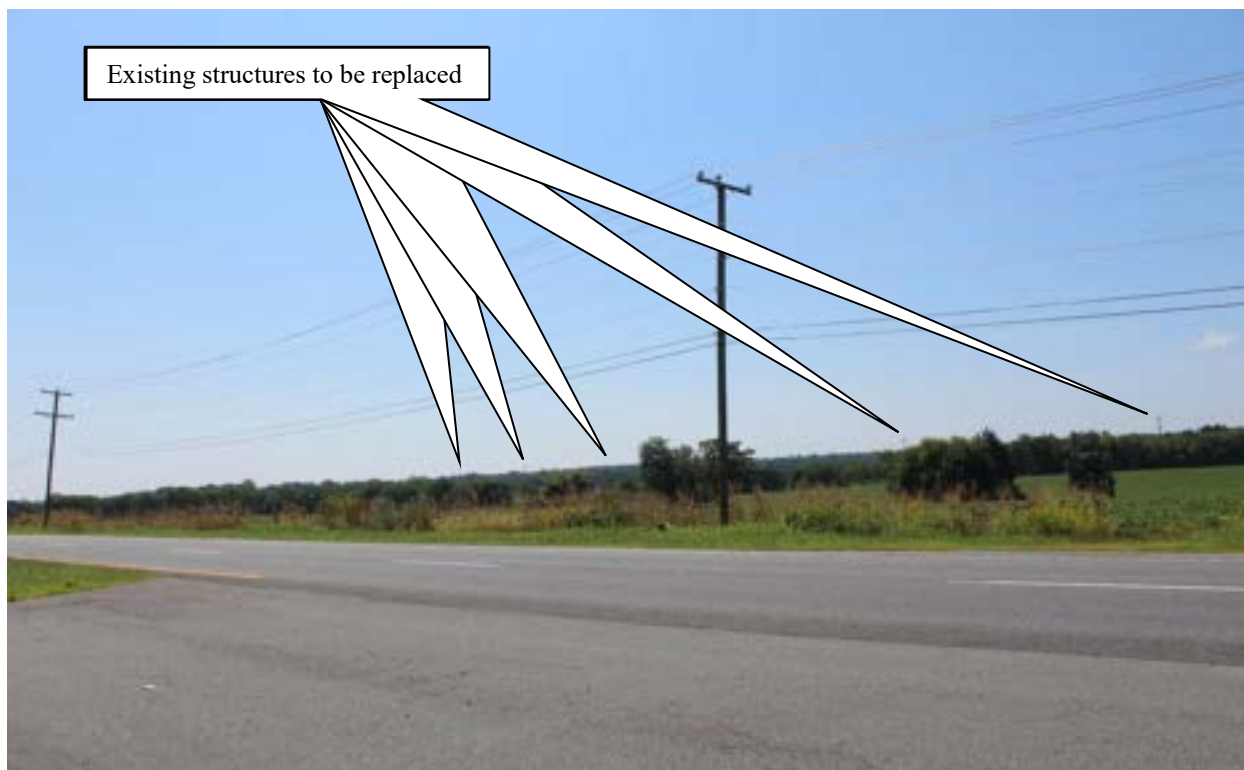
Photo location 9- View from Route 3 near Signal Hill Farm (Multiple existing project structures visible), facing southeast.
